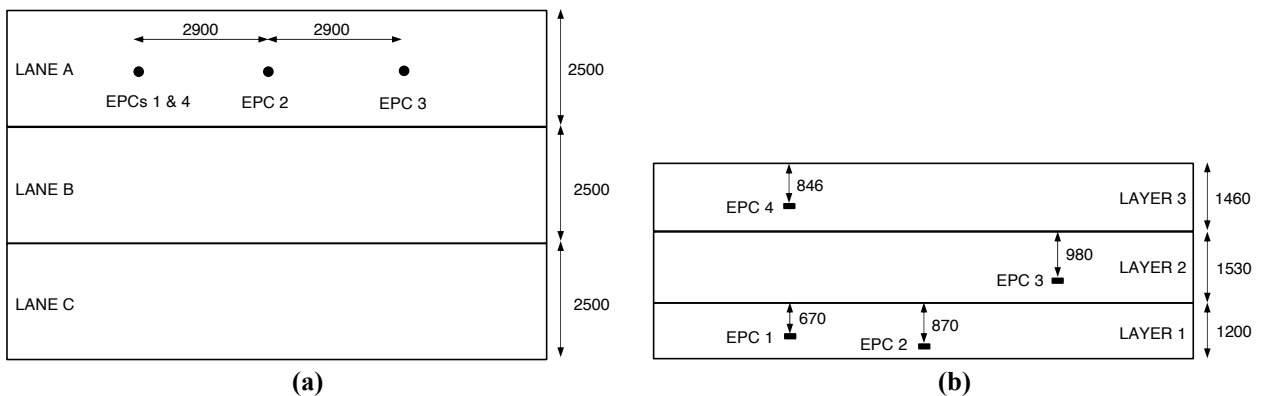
Test pad layout: (a) plan view, and (b) cross-sectional elevation. Dimensions in mm. (After Scott et al. 2021.)
